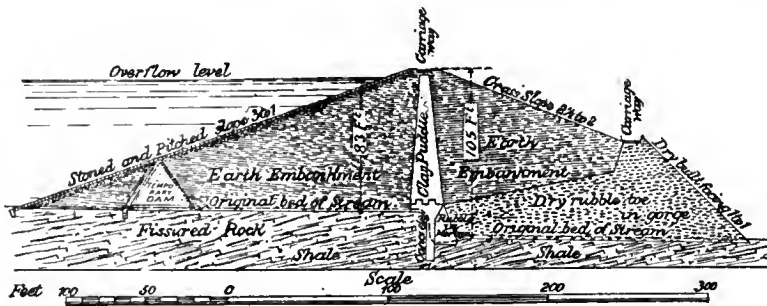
Earth Embankment, with stone toe and concrete trench.
